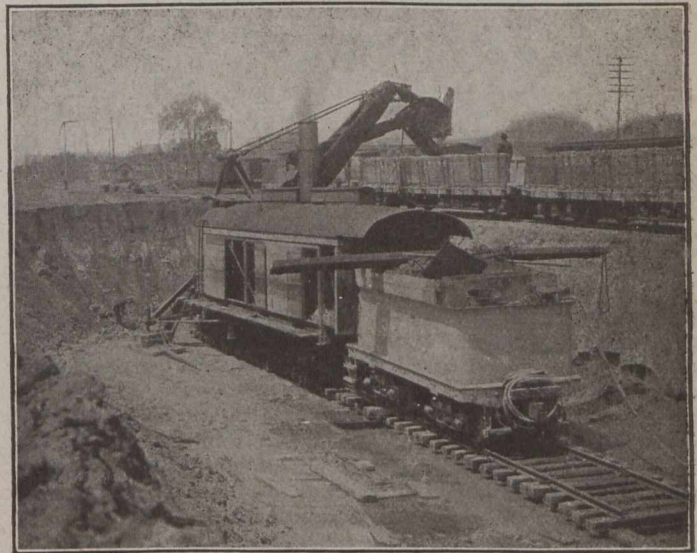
TYPICAL RAILWAY STEAM SHOVEL
